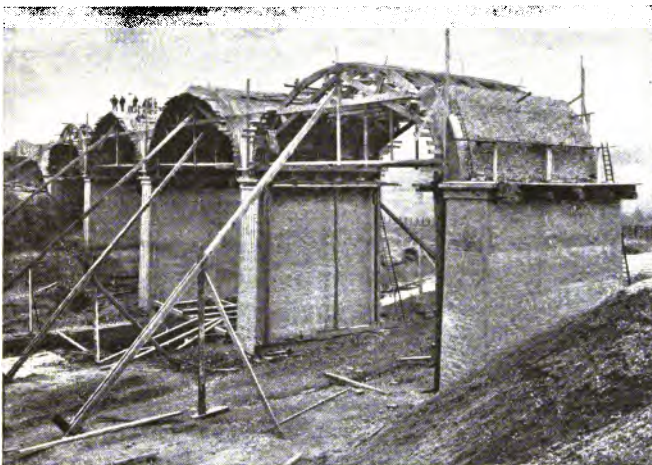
The building of a brick railway bridge, showing the wooden "centres" or supports for the arches during construction.
